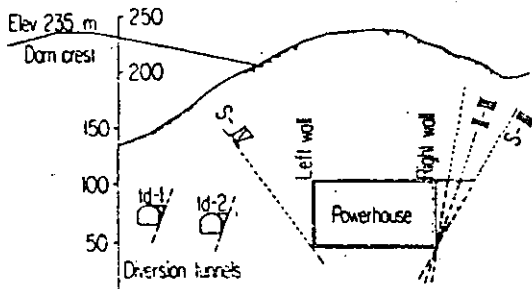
This section shows the wedges of the right wall of caverns and diversion tunnels
